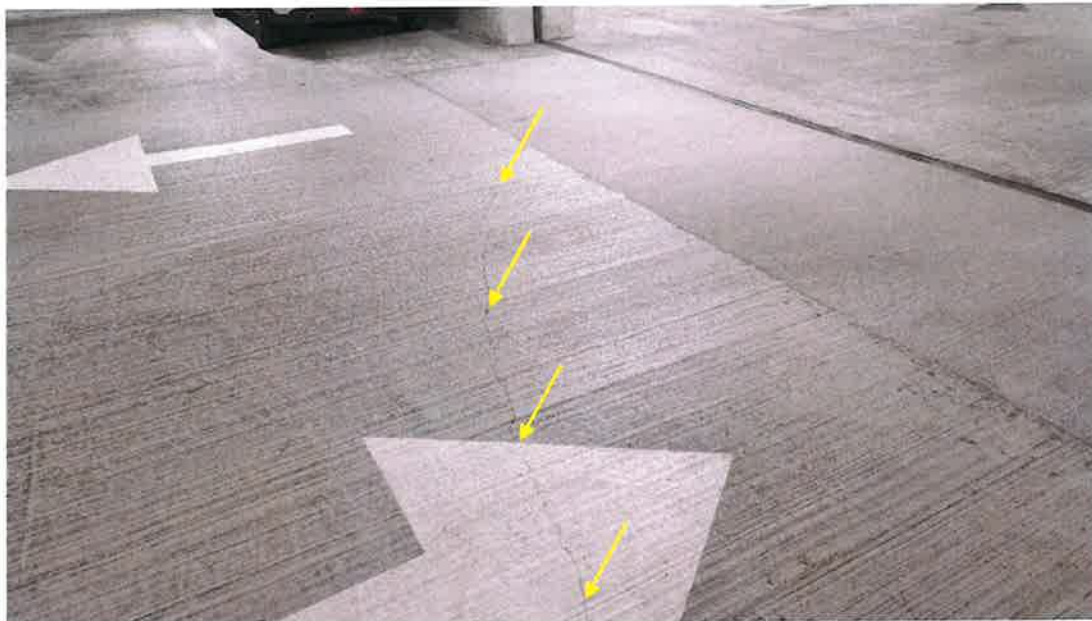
Cracking at Repaired Expansion Joint Following Banded Tendons
